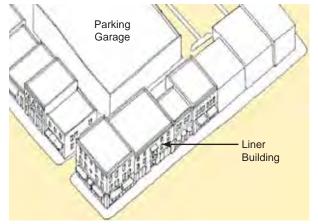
A liner building should be used to shield the blank façade of a large footprint building or parking garage from view of pedestrians. It must be deep enough to have habitable space, and have doors and windows that face the sidewalk.
